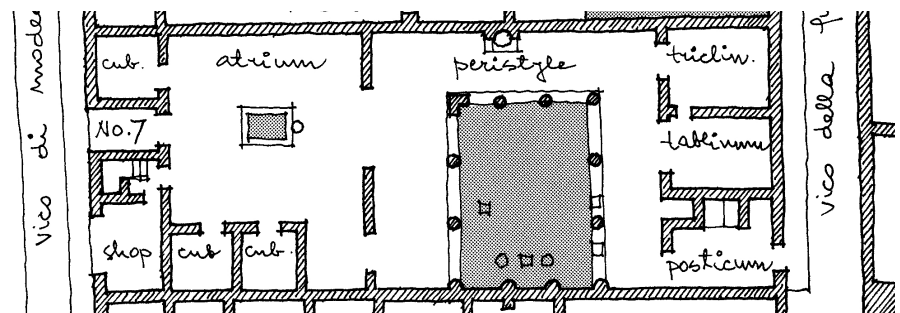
Typical Roman house floorplan (Schoenauer, 1981).
